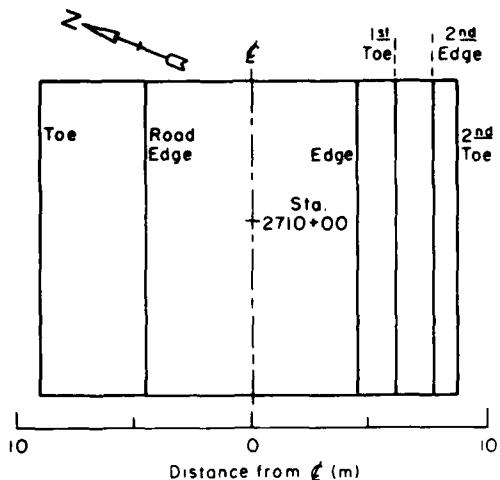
Plan view of the TAPS Road mile 50.7 site.
